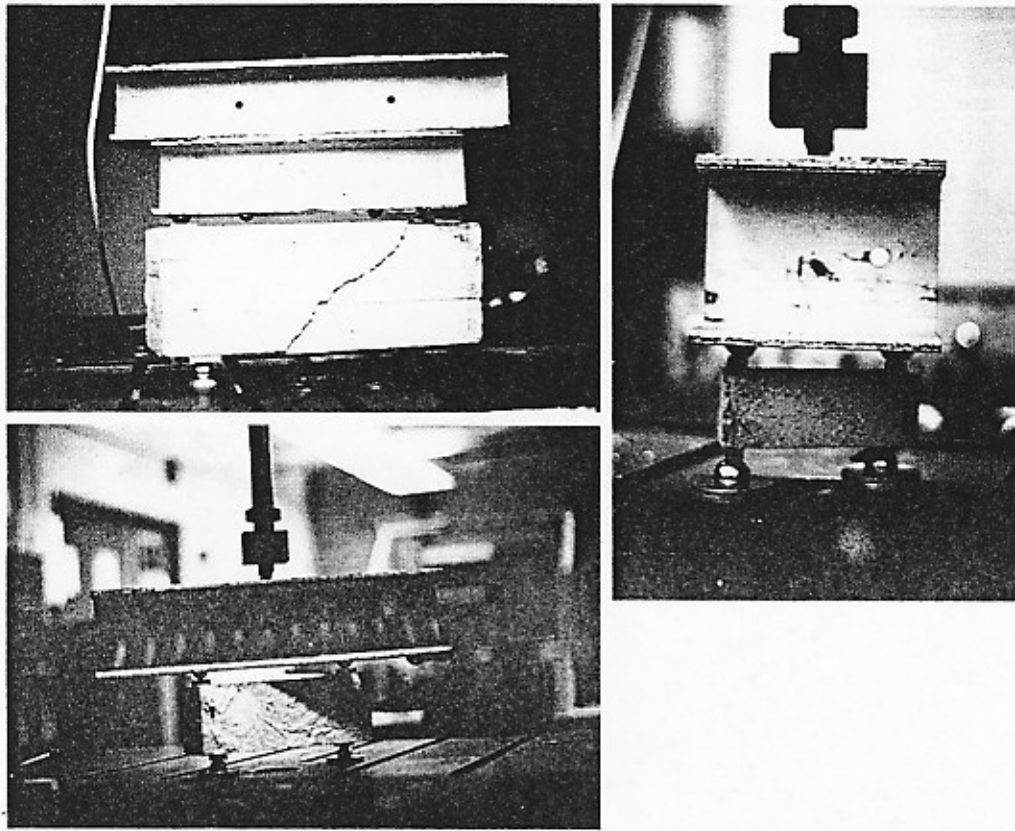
Photograph of the specimens in the testing machine, showing the method of loading.
